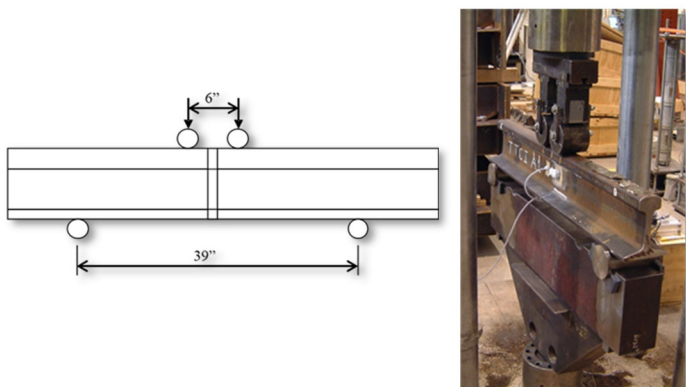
Schematic drawing of rail fatigue test configuration and photograph of specimen during testing.
